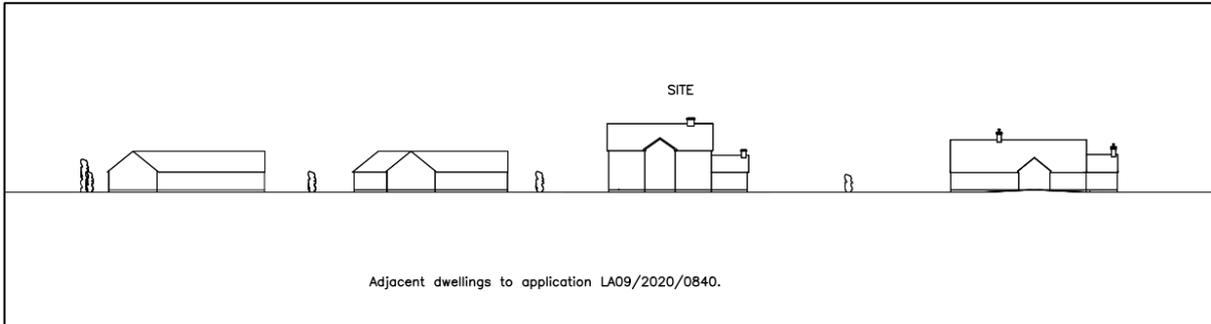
How the proposed dwelling would read with existing dwellings along Coole Road
